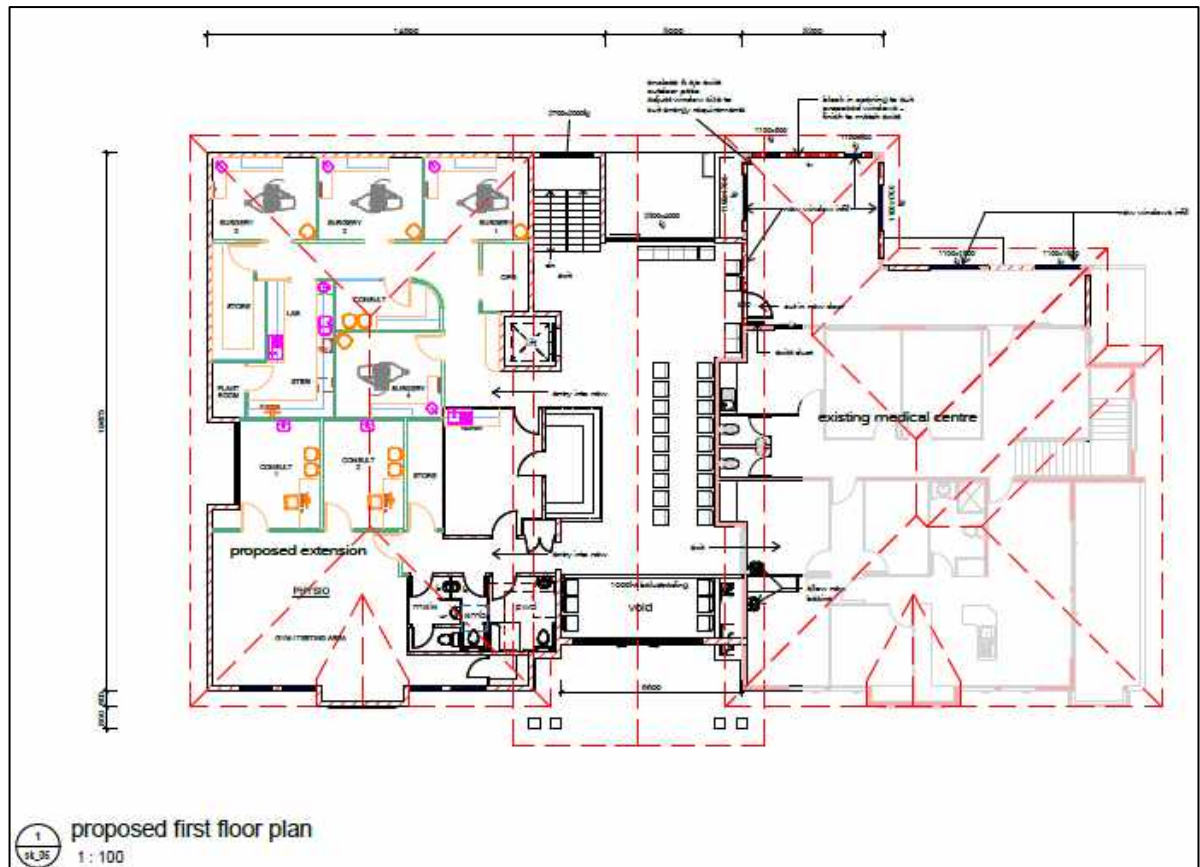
Internal Layout Plan (Source: Concepts Building Design)
